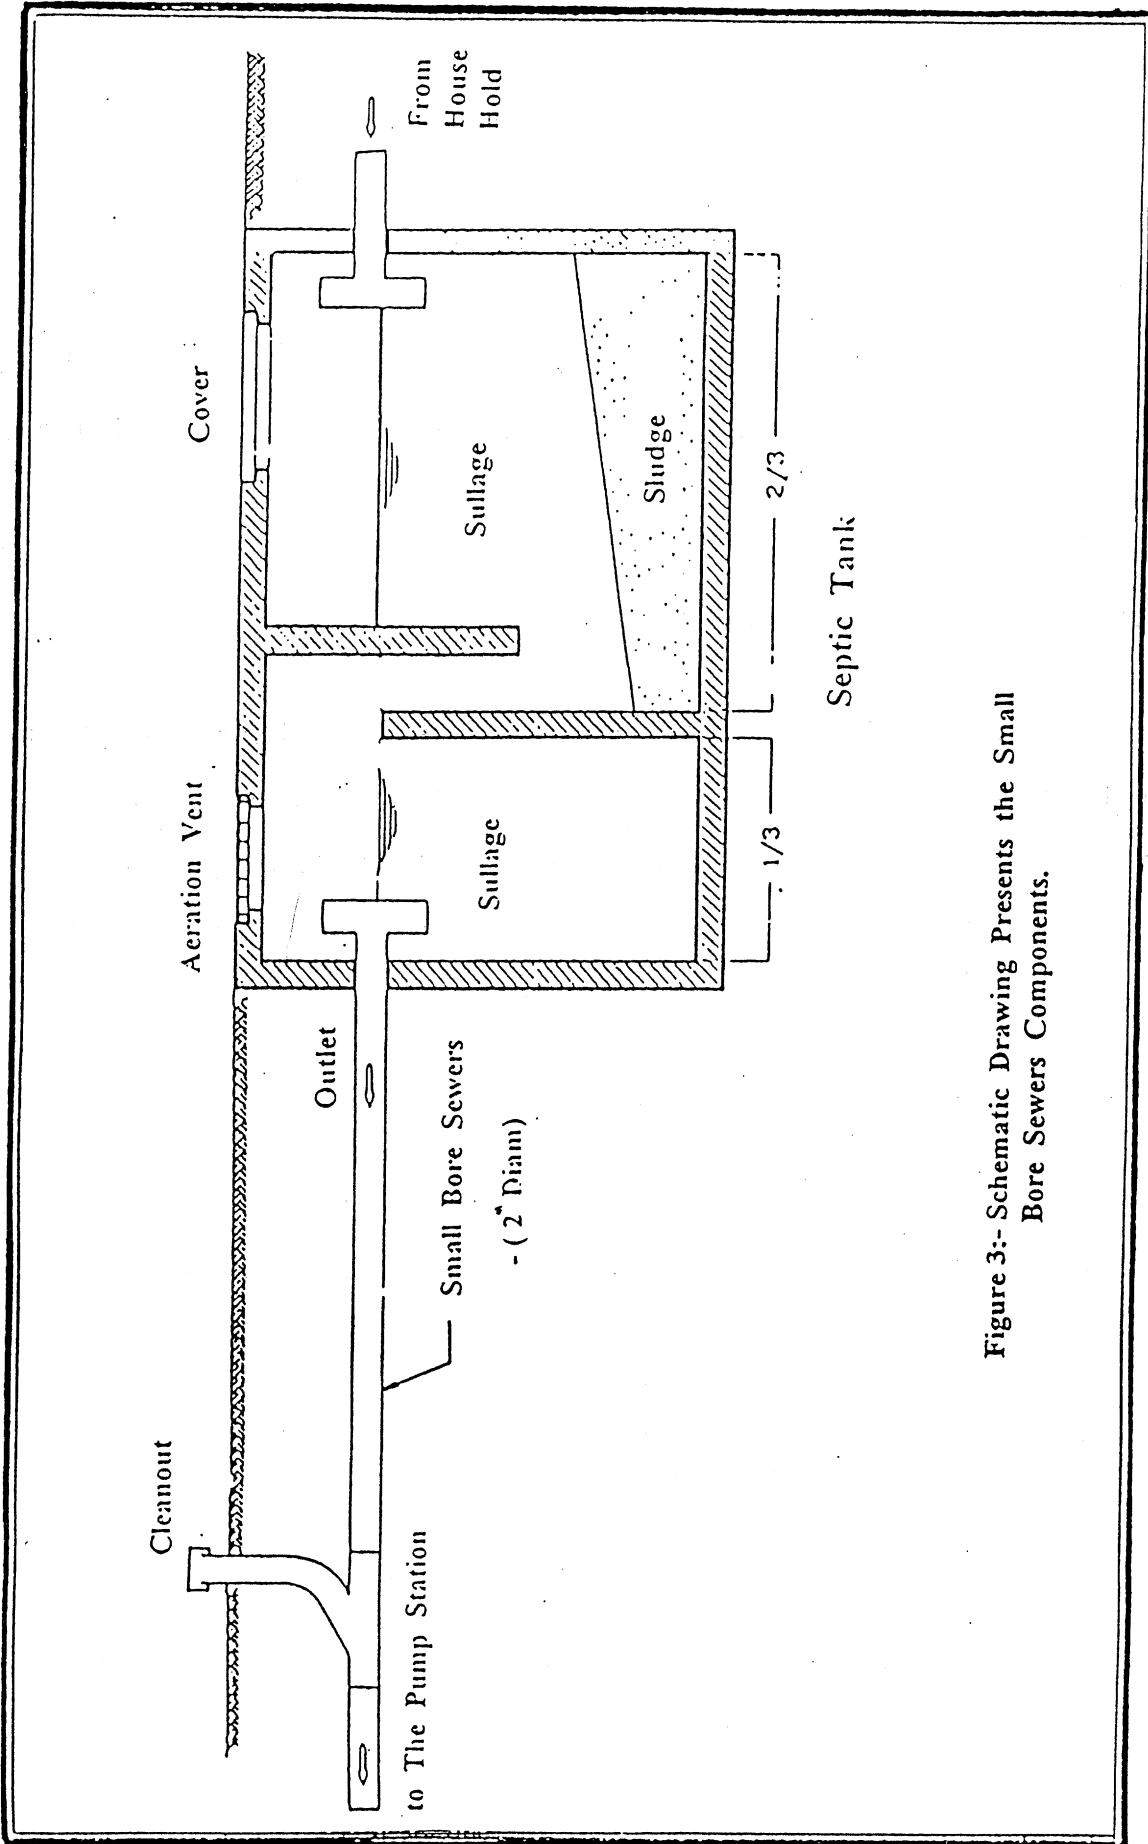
Schematic Drawing Presents the Small Bore Sewers Components.
